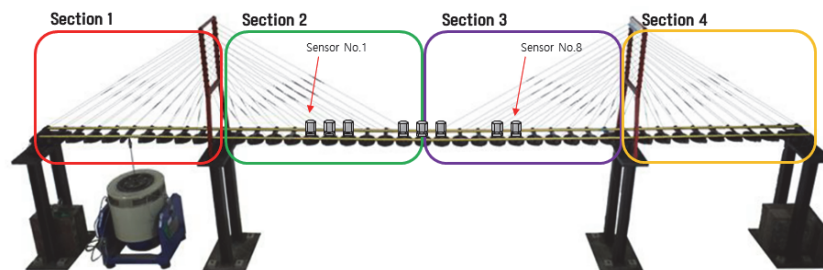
Damage assessment by Section of Cable-Stayed Bridge
